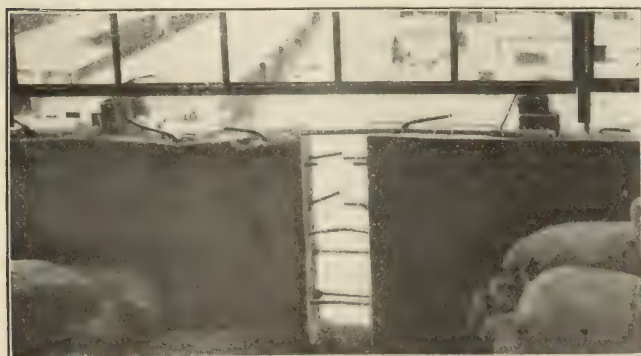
WALL BEAM CUT TO FACILITATE MEASUREMENTS
